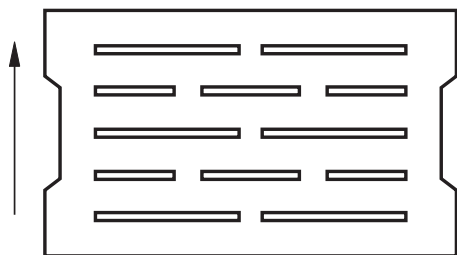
Lightweight concrete masonry units — Geometry 1,7/x
